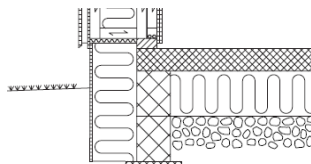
example of a foundation solution that could reduce the excavation expenses [7]
